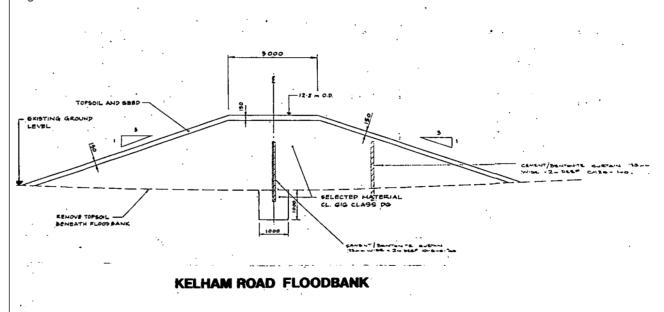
Cross section through the Newark roundabout flood defence embankment.
